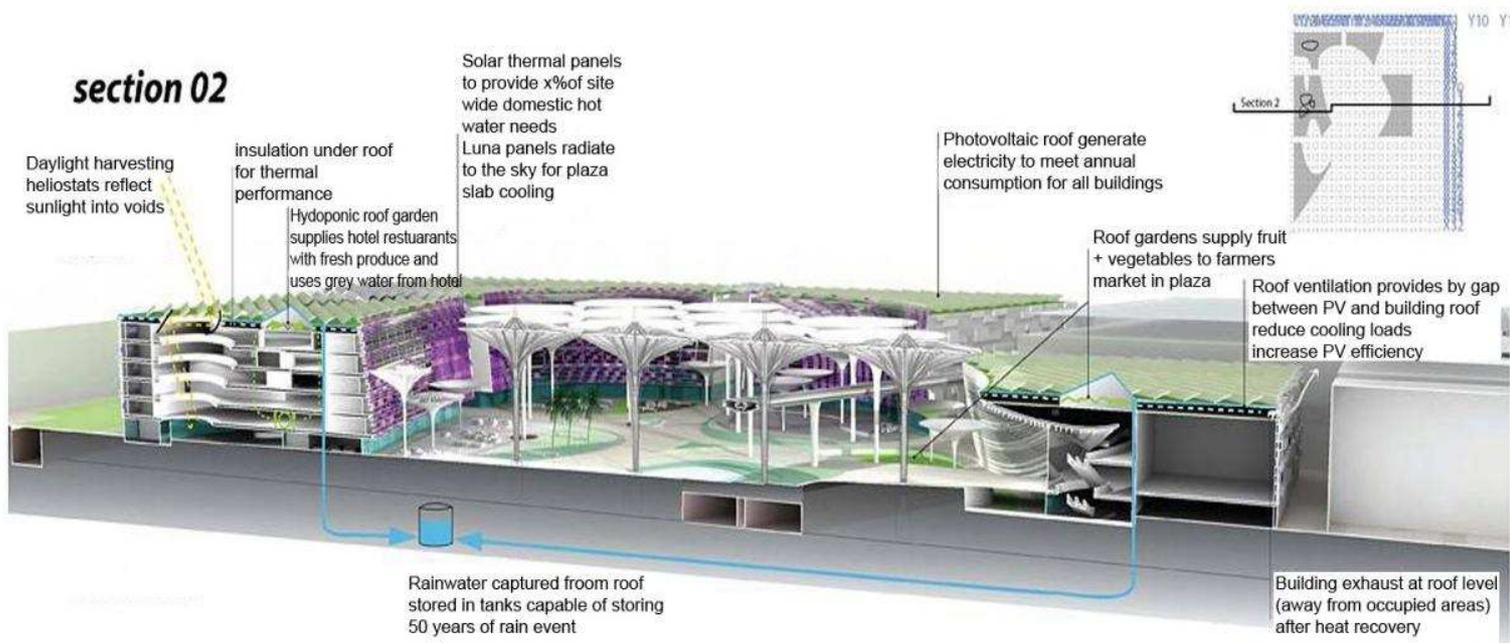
shows cross sections demonstrating water flows to underground water tanks.
